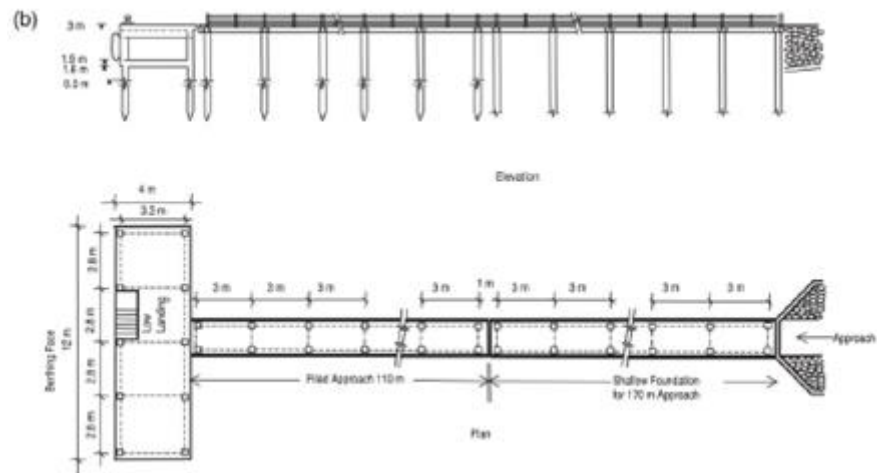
Gandhinagar jetty in North Andaman: (b) Elevation and plan. (Goutam Mondal, Durgesh C. Rai, 2006)
